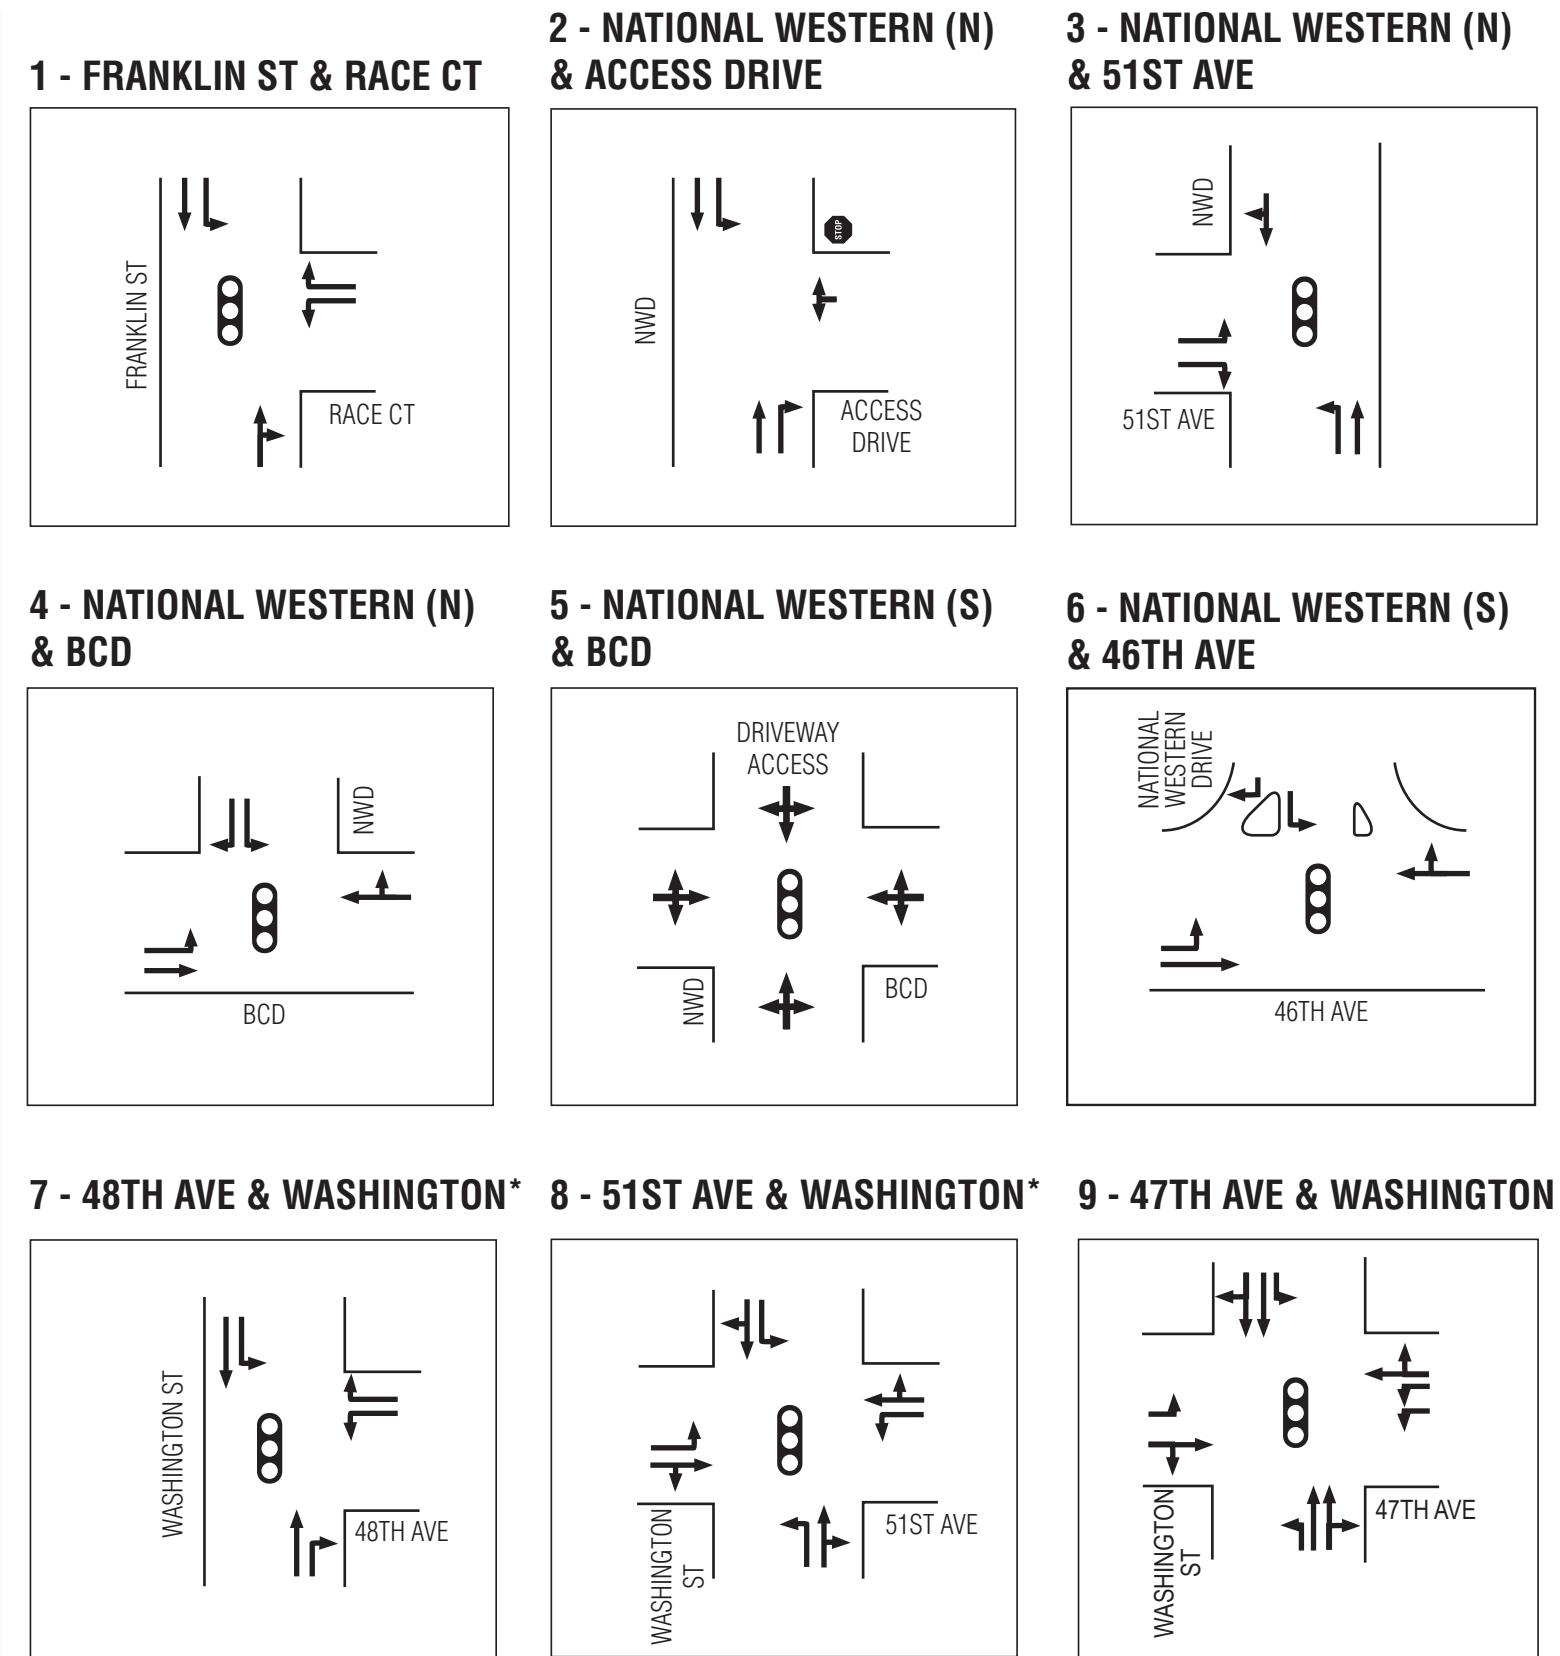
FULL BUILD OUT | ROADWAY NETWORK
